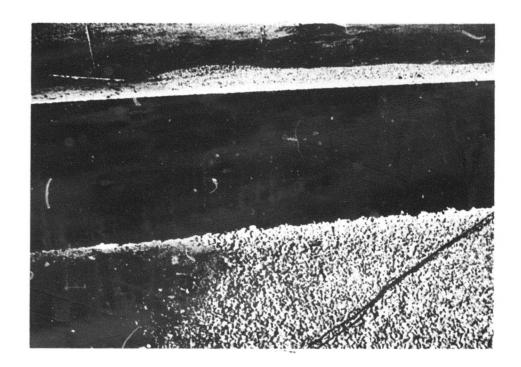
2-in. asphalt concrete over section A crushed rock on right and section B bank-run gravel on left.
